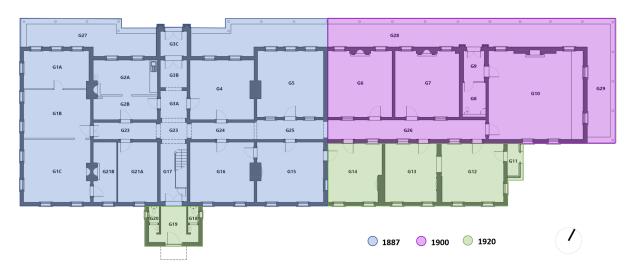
Phases of Construction: Ground Floor Plan. Source: Curio Projects, 2022.
